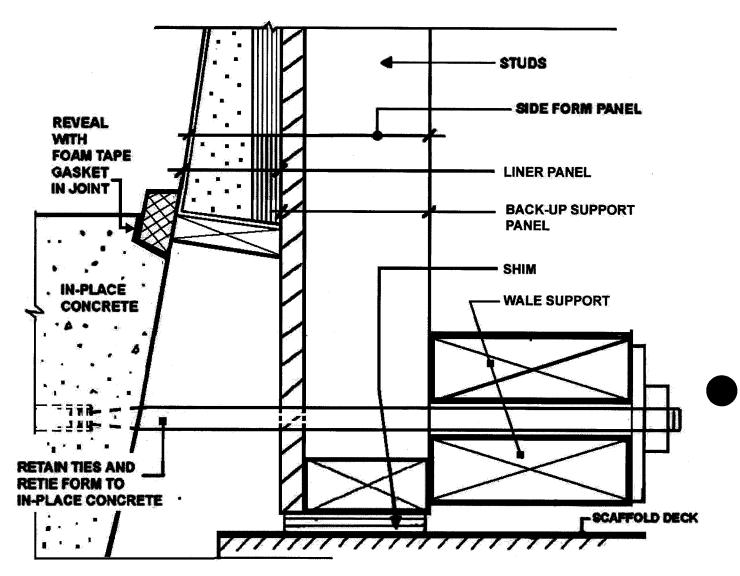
WALL REVEALED CONSTRUCTION JOINT
